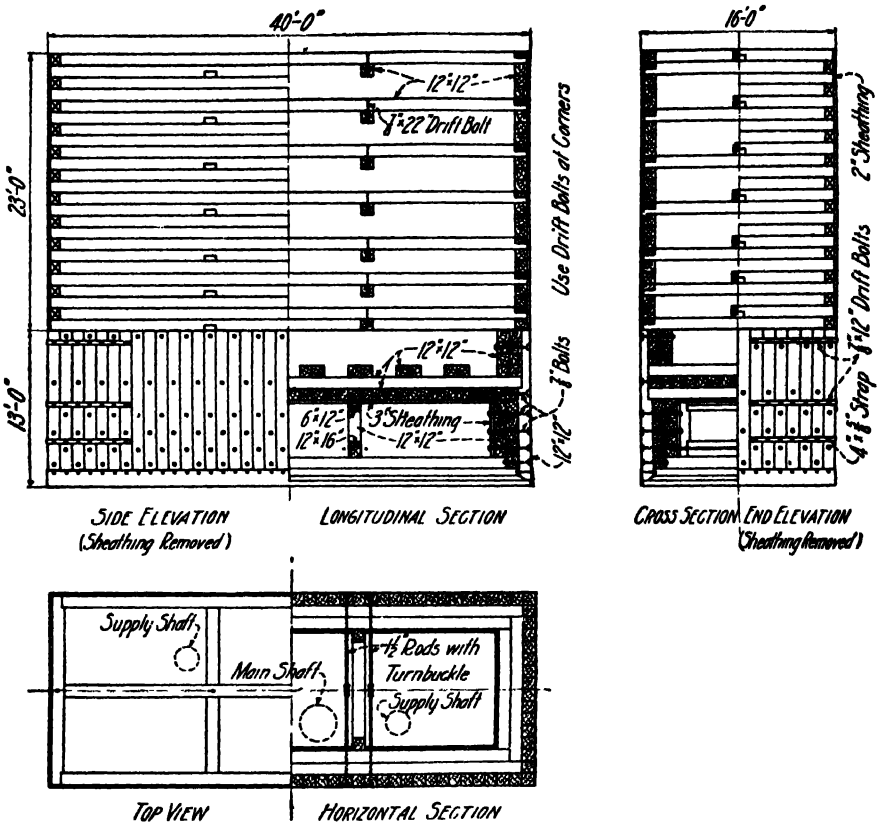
Details of Pneumatic Caisson for a Rectangular Pier.
